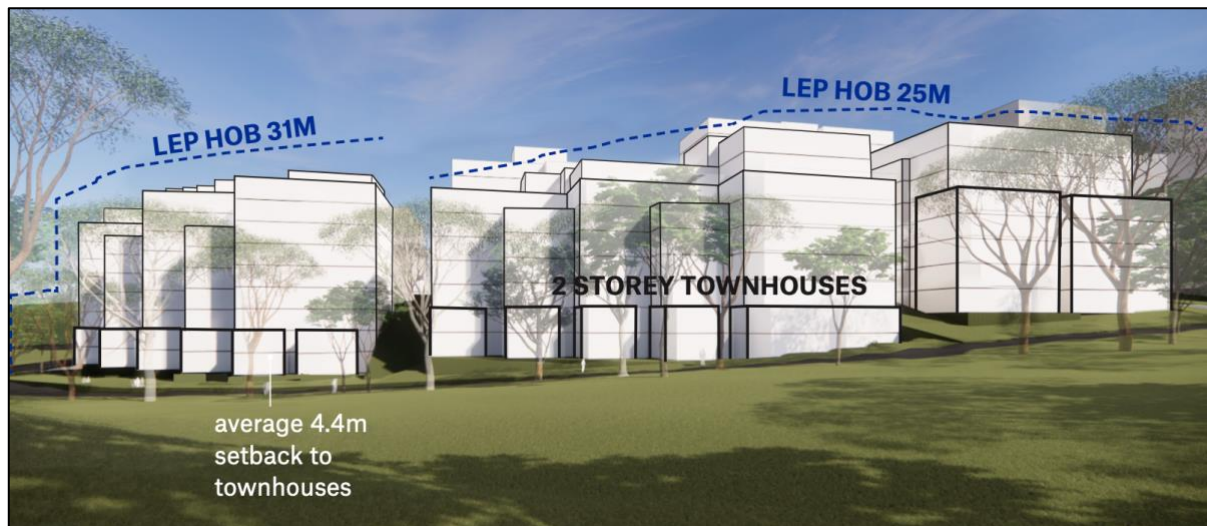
Revised and Proposed Upper Level Setback Arrangement as Submitted with DA
